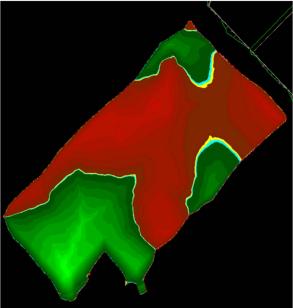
Plan of Plant Prelim. Bulk Earthworks Design
